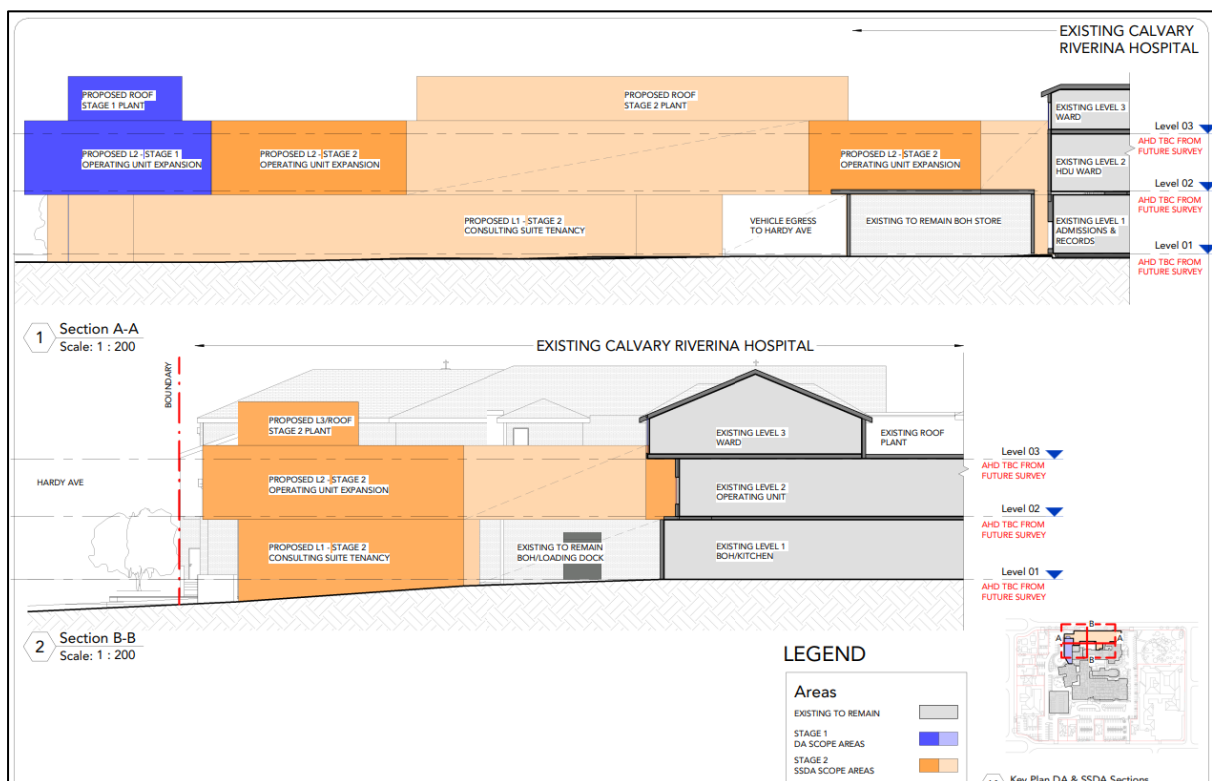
Proposed Sections - DA & SSDA Scope (Source: Team2 Architects, 2026)
